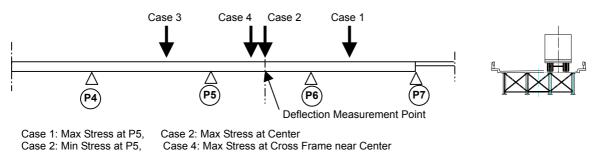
Static Load Case for No.26 Chirripo Bridge
